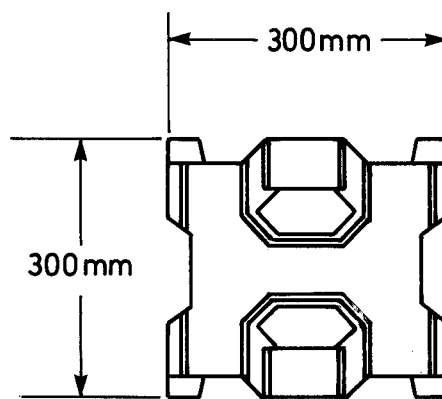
Typical 'Tongue and Groove' concrete block revetment
